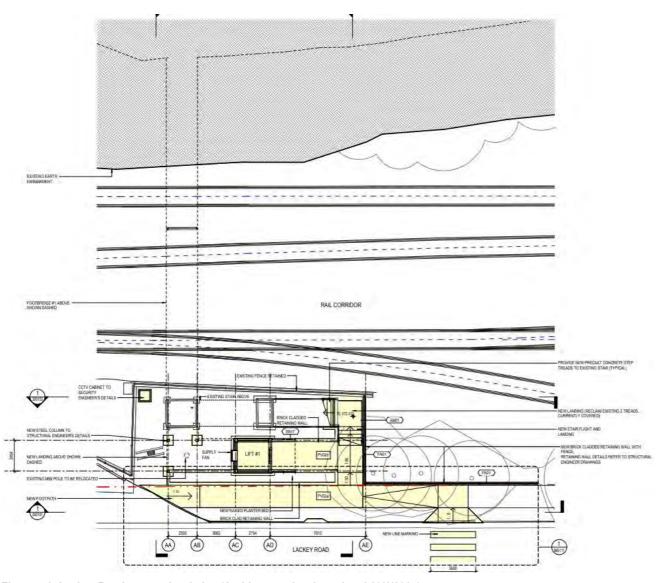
Lackey Road – street level plan (Architectus, drawings dated 19/1/2024)
